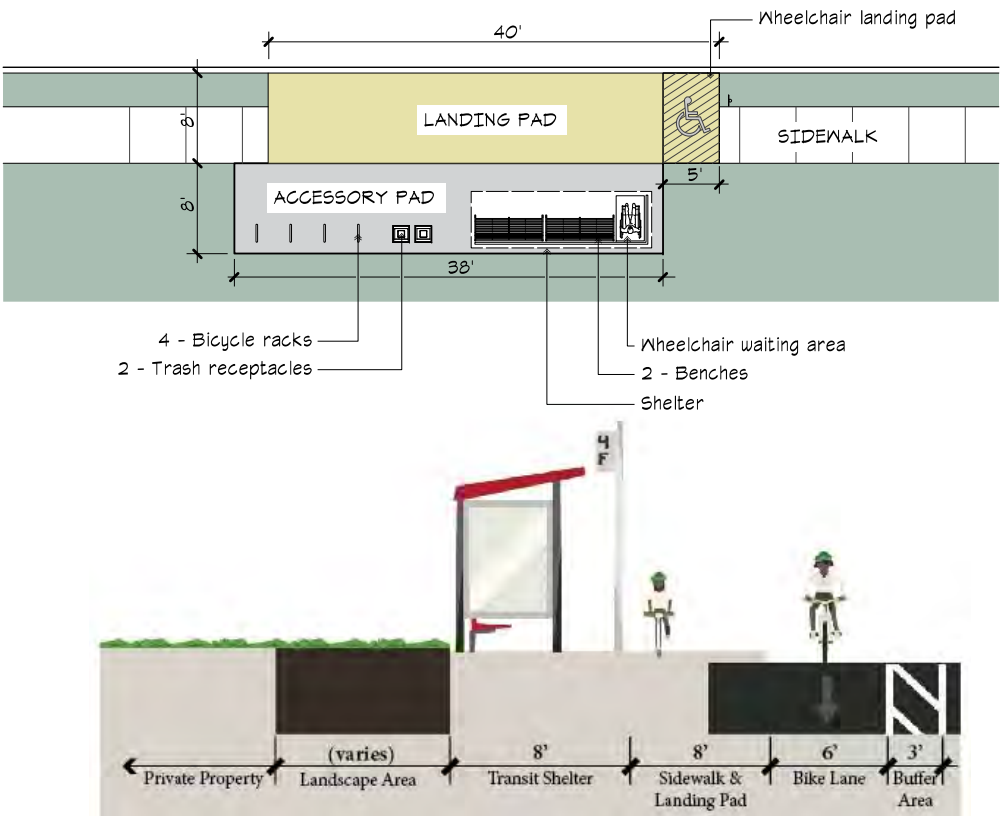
Transit Shelter with Sidewalk Setback from the Roadway
